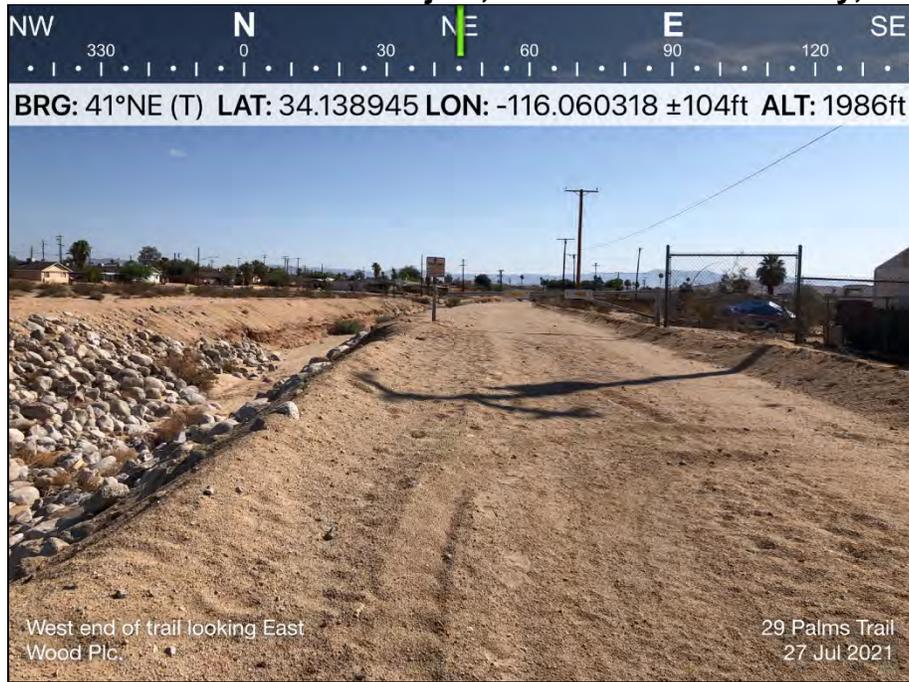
West end of proposed trail route at Split Rock Road facing east.
